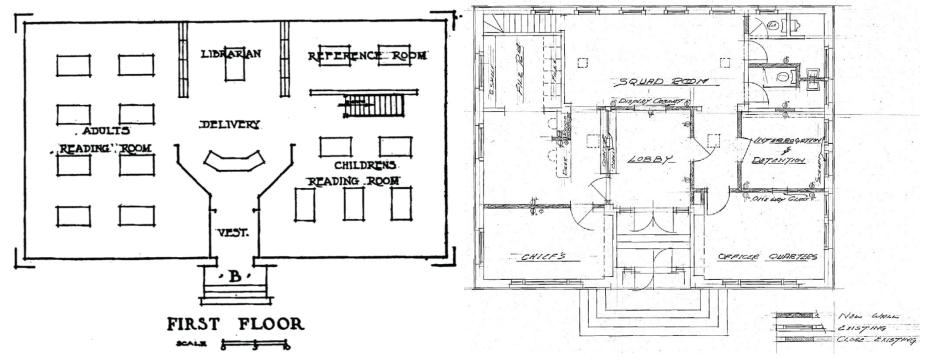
(LEFT): Sketch plan of a typical Carnegie Library floor plan. (Bertram, 3).
